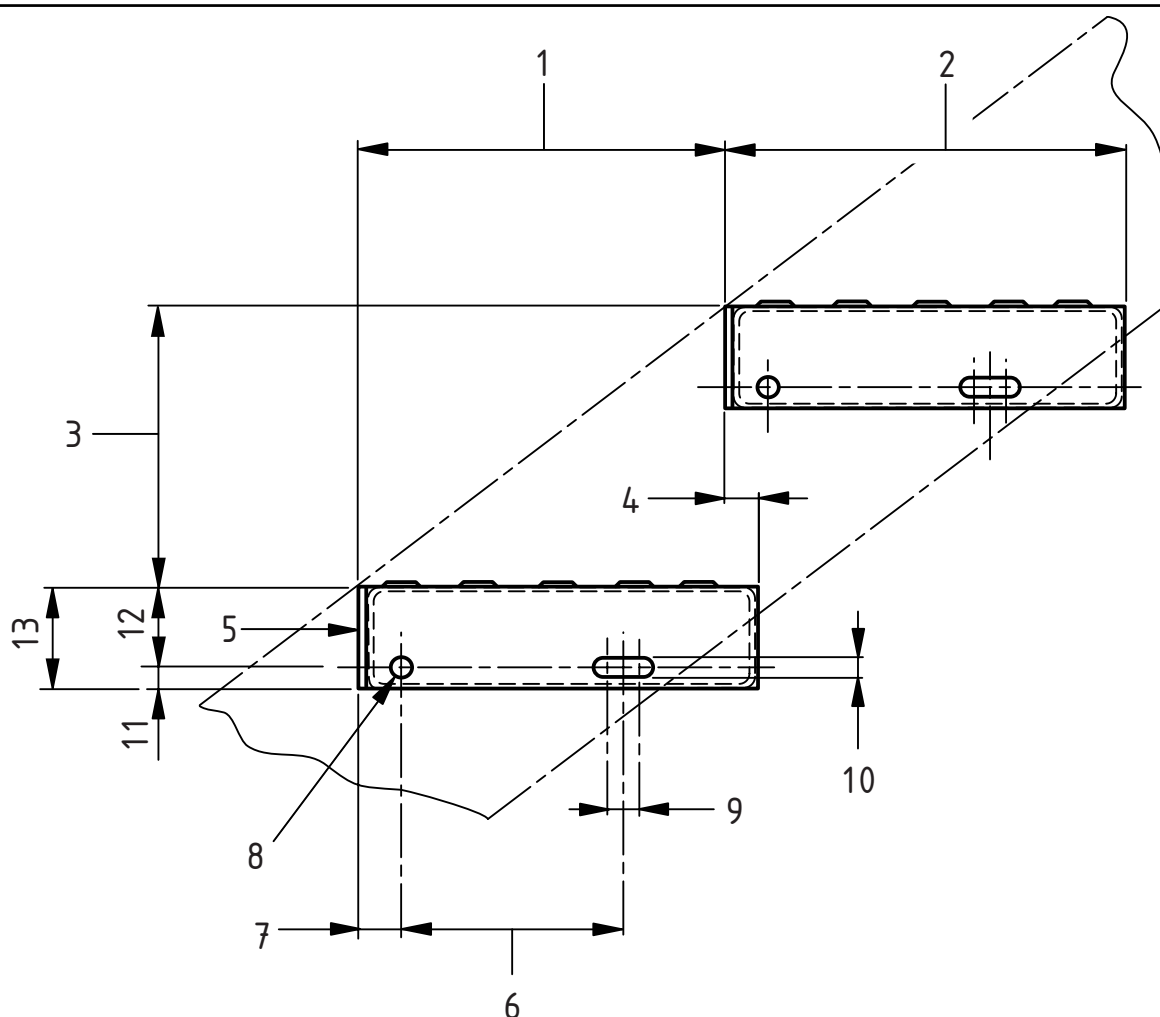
Drilling details for end plates to perforated metal plank stair treads
